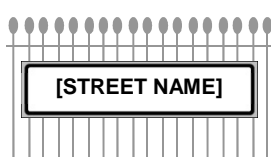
PLATE AFFIXED TO RIALINGS. Plate is to have a frame surround. The plate is to be manufactured with 2no channels horizontally along its rear to enable fixing to the railing by plate or clips.
